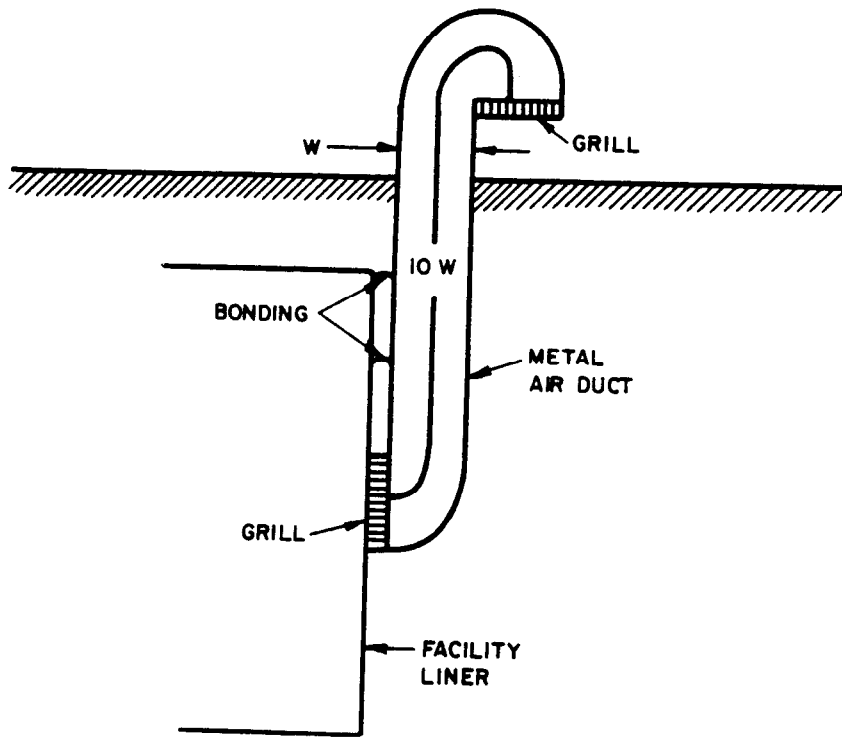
Air vent HEMP protection design. (Source: ref 5-7)
